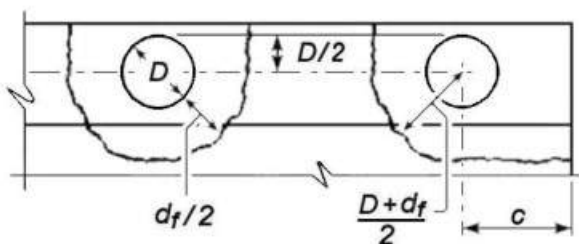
Critical Section for Circular Bearing Pads
